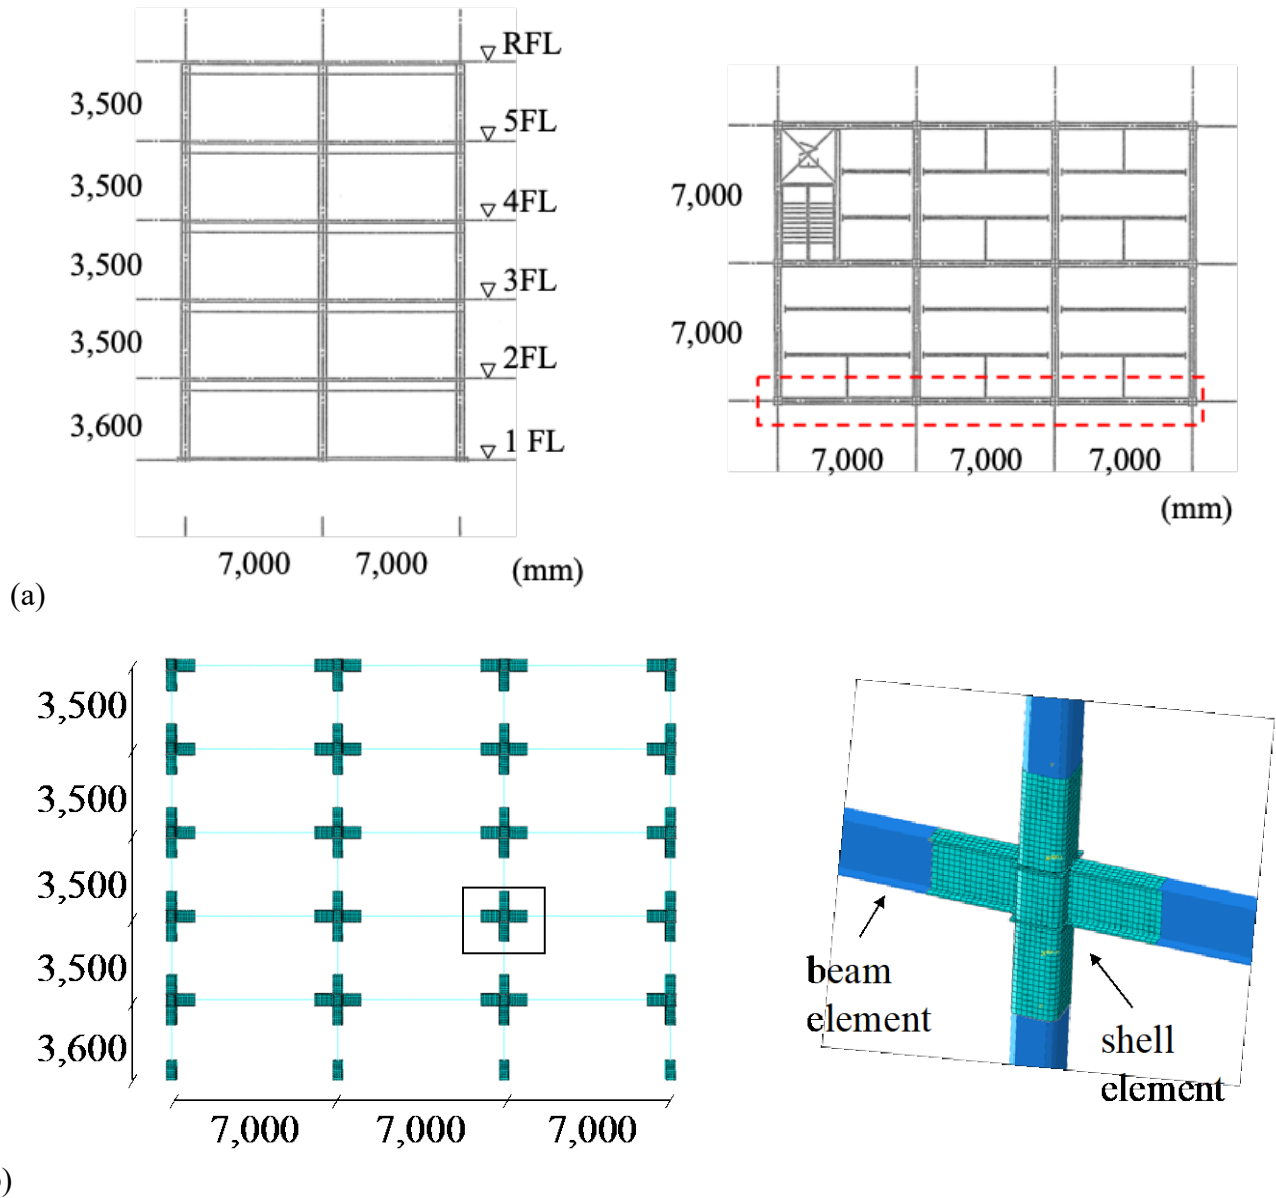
Structure model: a) elevation and plan view of the 3D steel MRF (mm) [34]; b) FE model of the plane frame as developed in ABAQUS [26]
